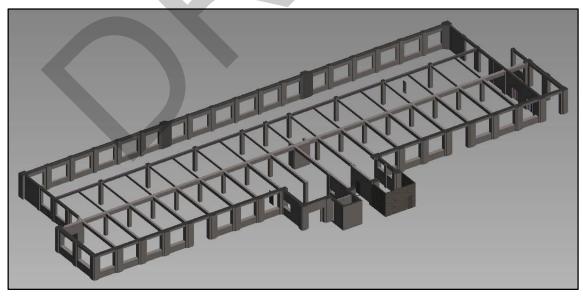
Cutaway showing beams, walls, and columns at the ground floor level at GNS
